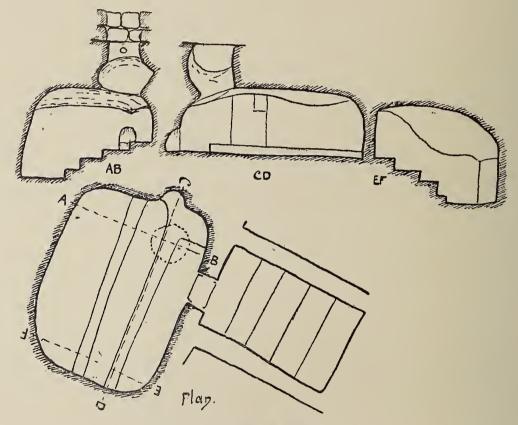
PLAN AND SECTIONS OF NO. 2.
